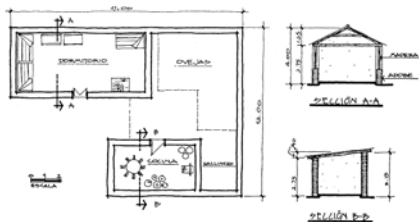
Plan shape and cross-sections of a residential home consisting of a minifalda and an adobe part (location: Zunil, Guatemala; from Marroquin and G
